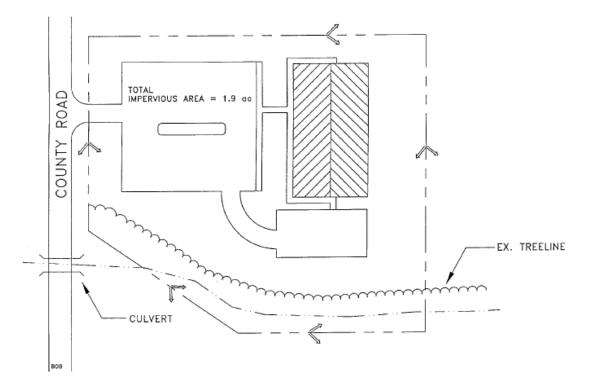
Bioretention Example Site Plan Source: GSMM (2001)
